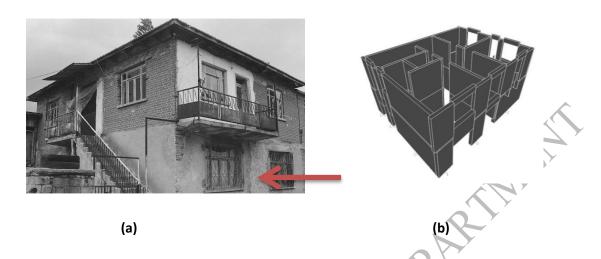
(a) The masonry building, the arrow shows the acting direction and (b) the model of the building
